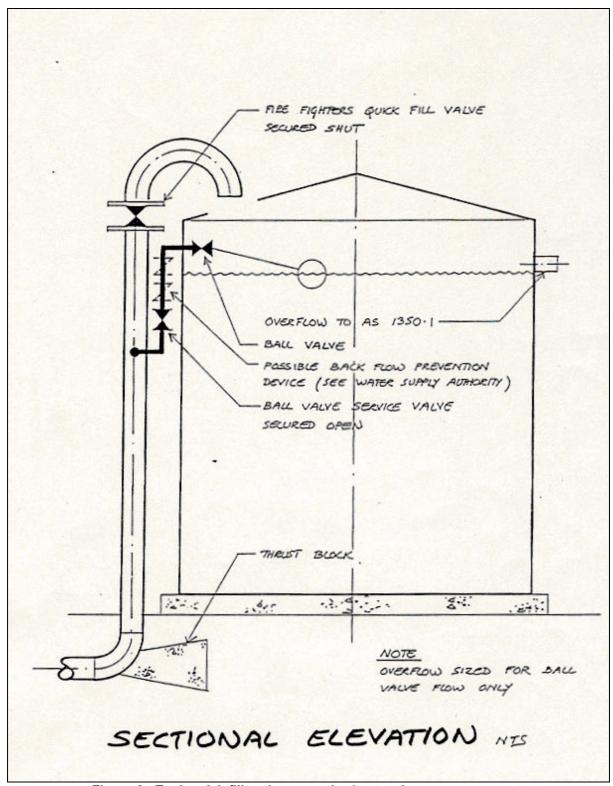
Tank quick fill and evaporation/test make-up arrangement.
